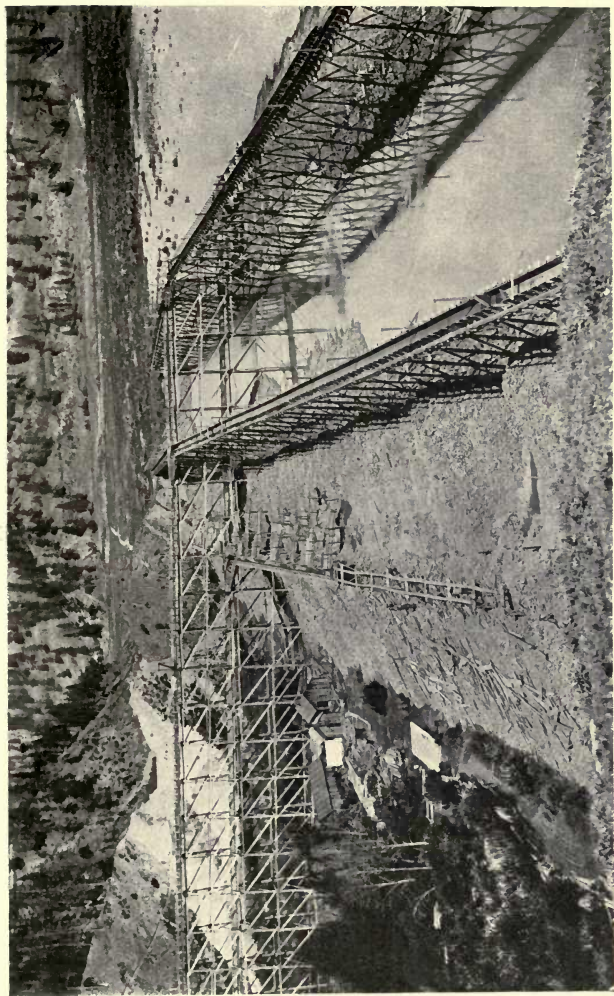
Trestles on Conconully Dam, showing Method of Hydraulic Construction.
